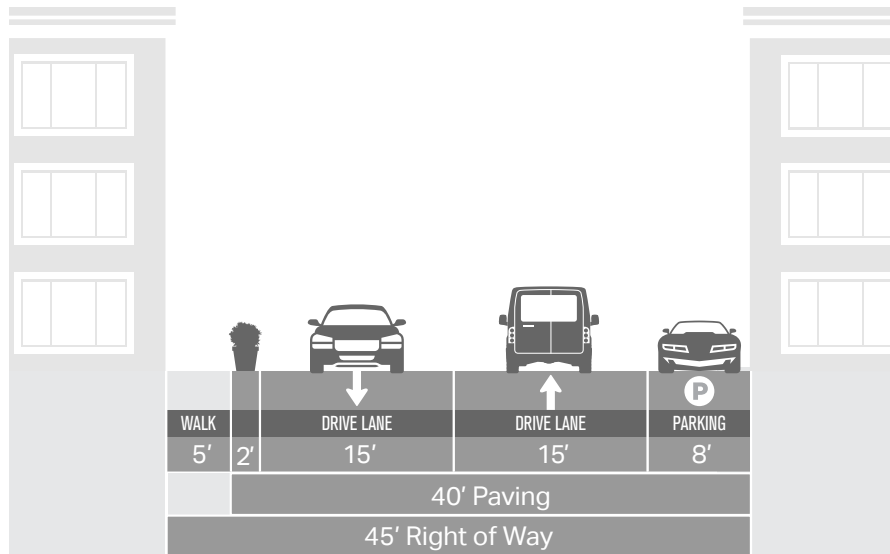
Existing Silver Street Section: Washington Avenue to Dart Street
